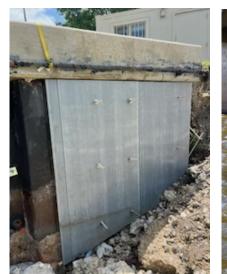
Repair of corroded steel sheet piles in Weston, FL, June 2024
